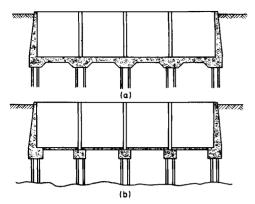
Piled basement floors. (a) With load transfer to floor slab; (b) with no load transfer to floor slab
